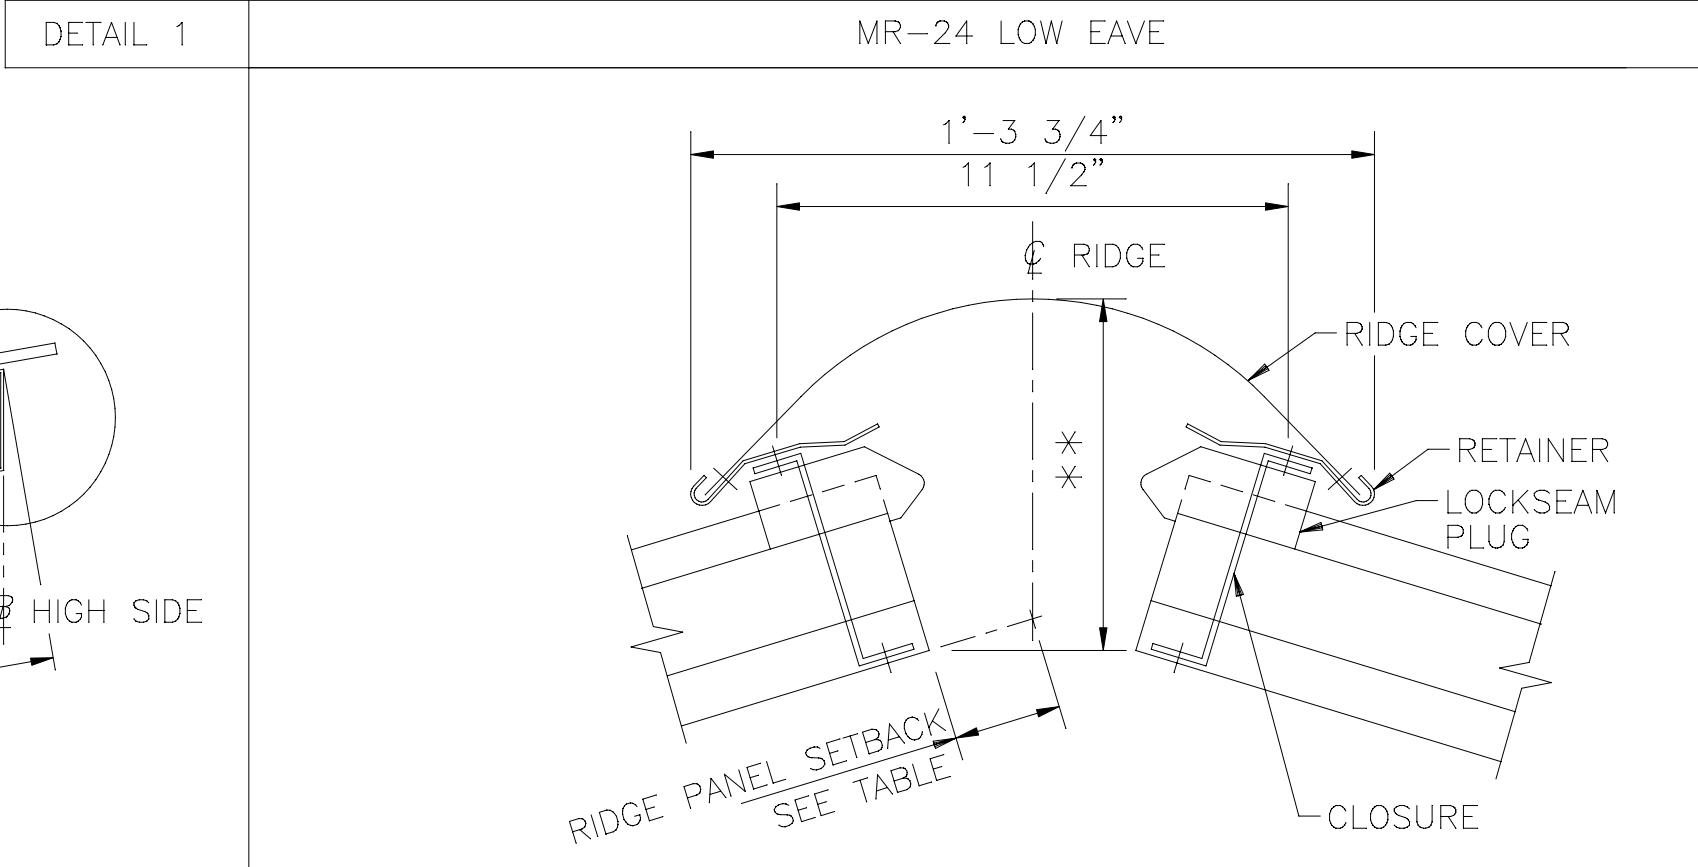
MR-24 SEAMED RIDGE ROOF SYSTEM
